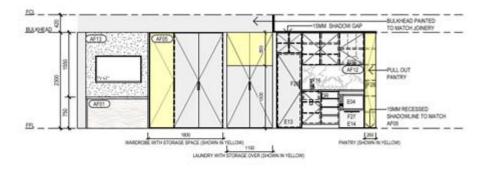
Plan and elevation showing typical boarding room with a tub, washer/dryer and storage area.
